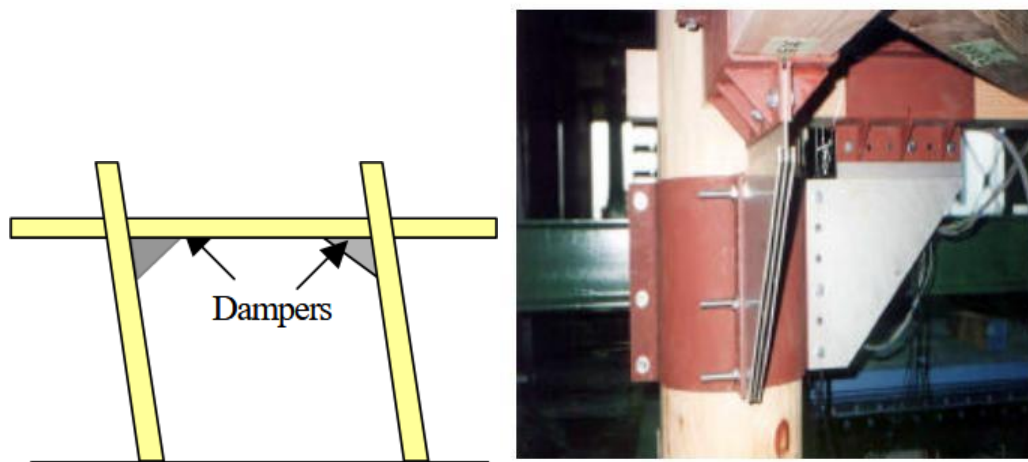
Installation of connecting-type dampers (SUZUKI et al., 2001) [28]
